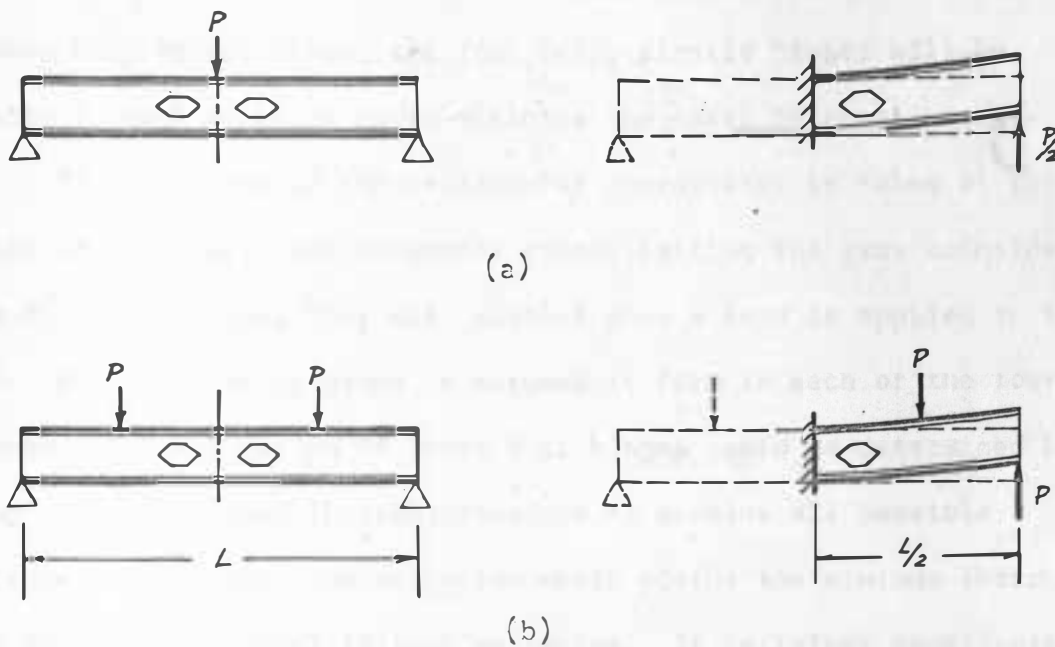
Correlation Between Simply Supported Beam and Cantilever Beam with Hexagonal Web Cutouts
